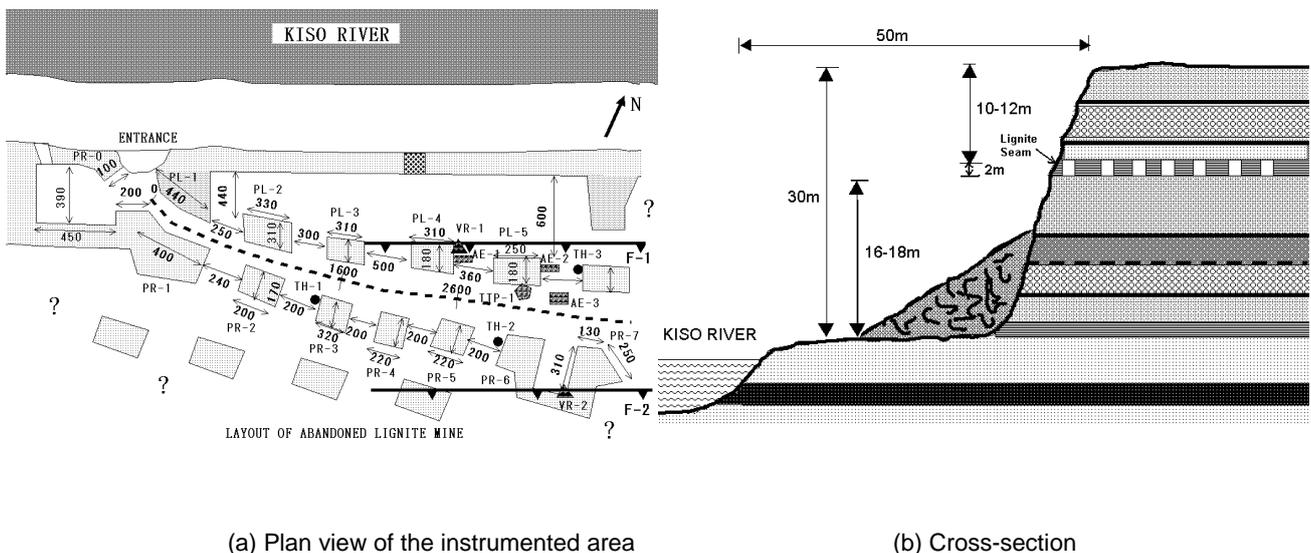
Plane view of the instrumented area of the abandoned mine and a typical cross-section
